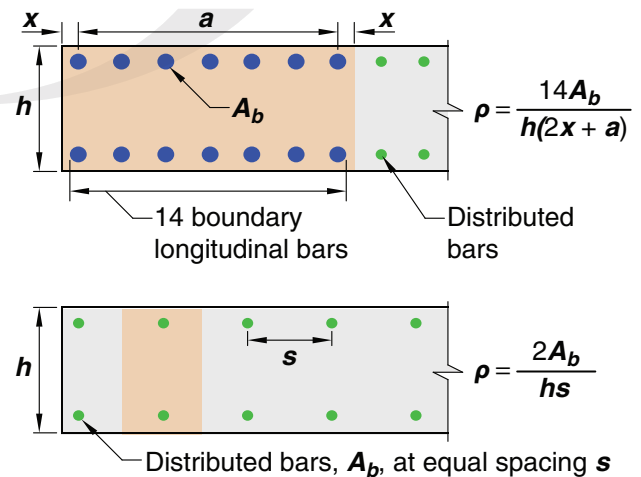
Longitudinal reinforcement ratios for typical wall boundary conditions.
